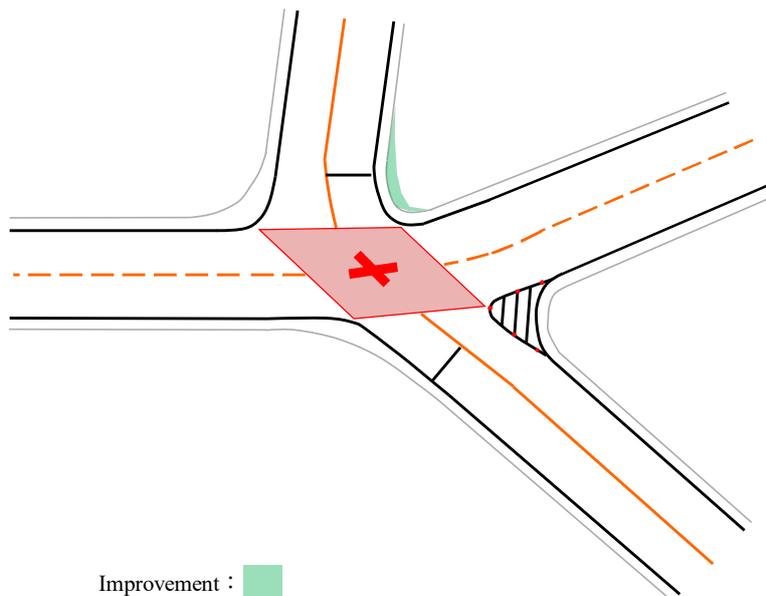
(B) T-shape with colored pavement, center making, and rumble strip
